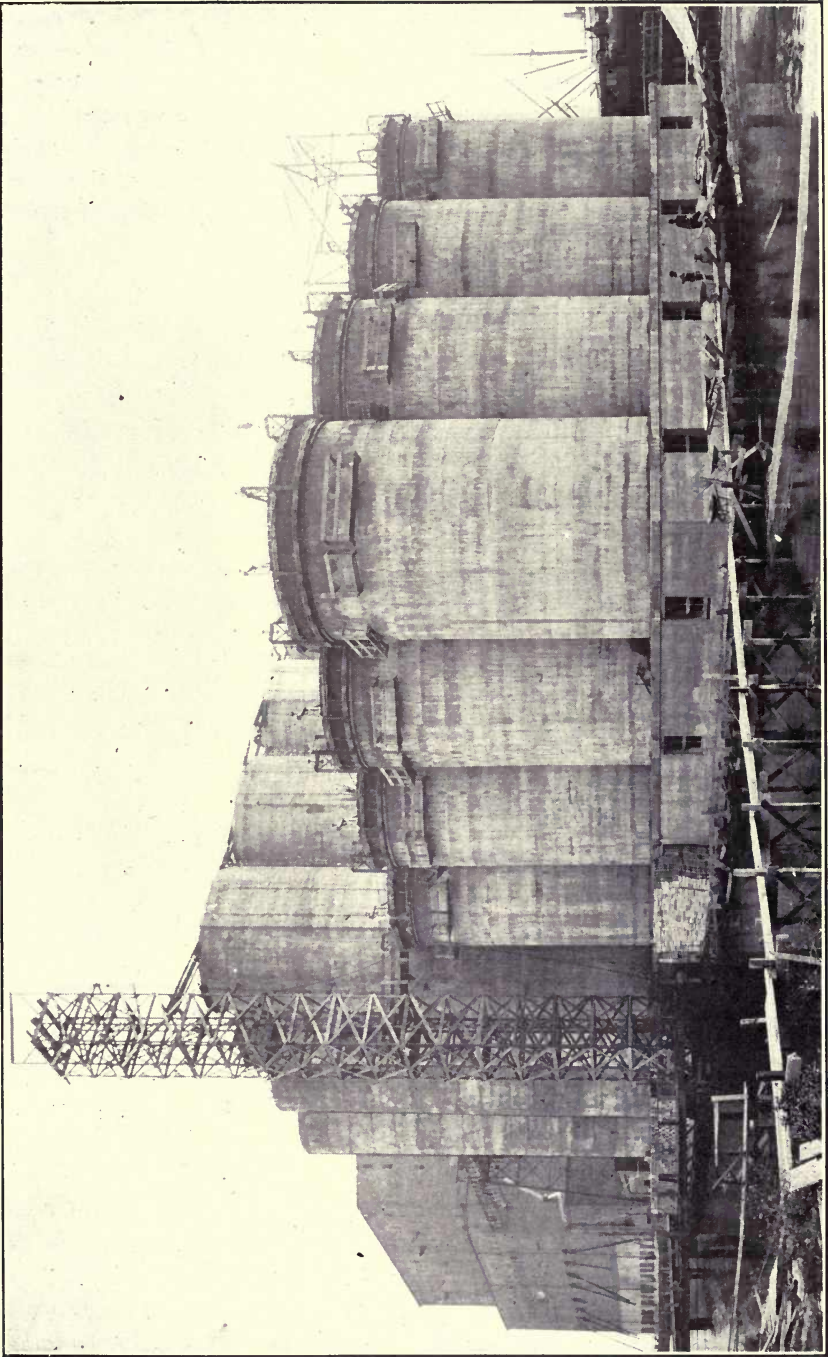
GRAIN ELEVATOR BEING CONSTRUCTED
